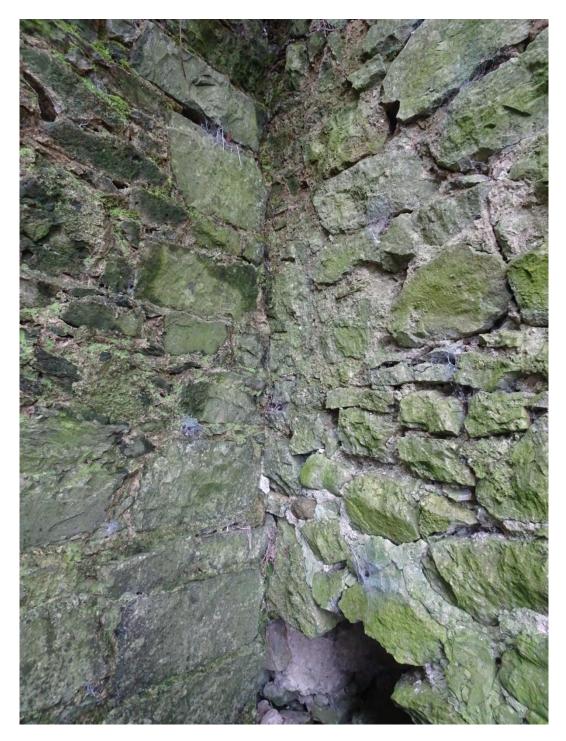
Junction of north wall (left) and east wall. No tie-in visible. Note missing facework near ground level.
